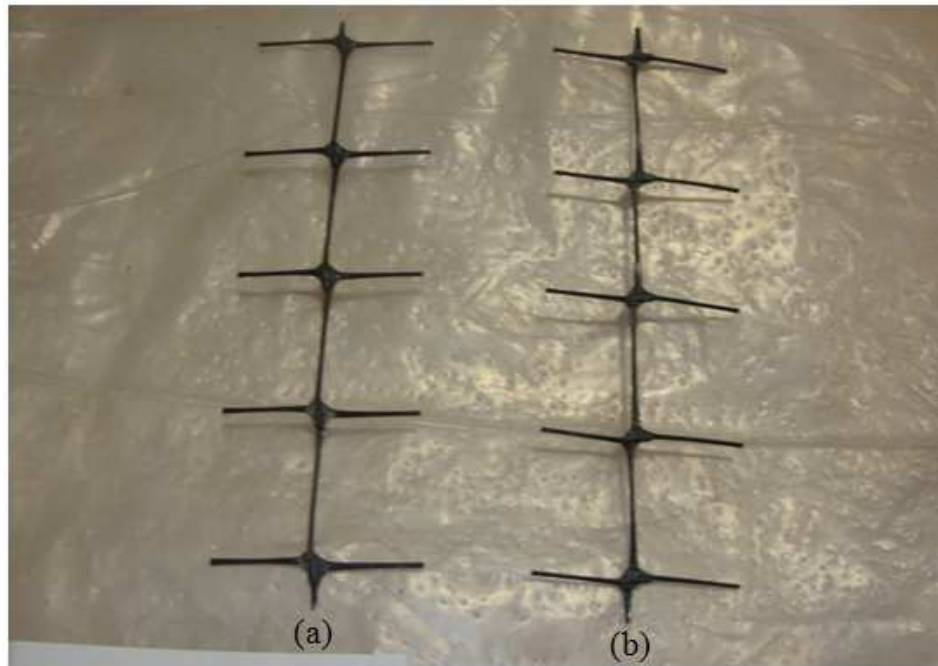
Damaged EGG2 (single layer) geogrid rib strength test specimens before the test: (a) MD specimens, (b) XD specimens
